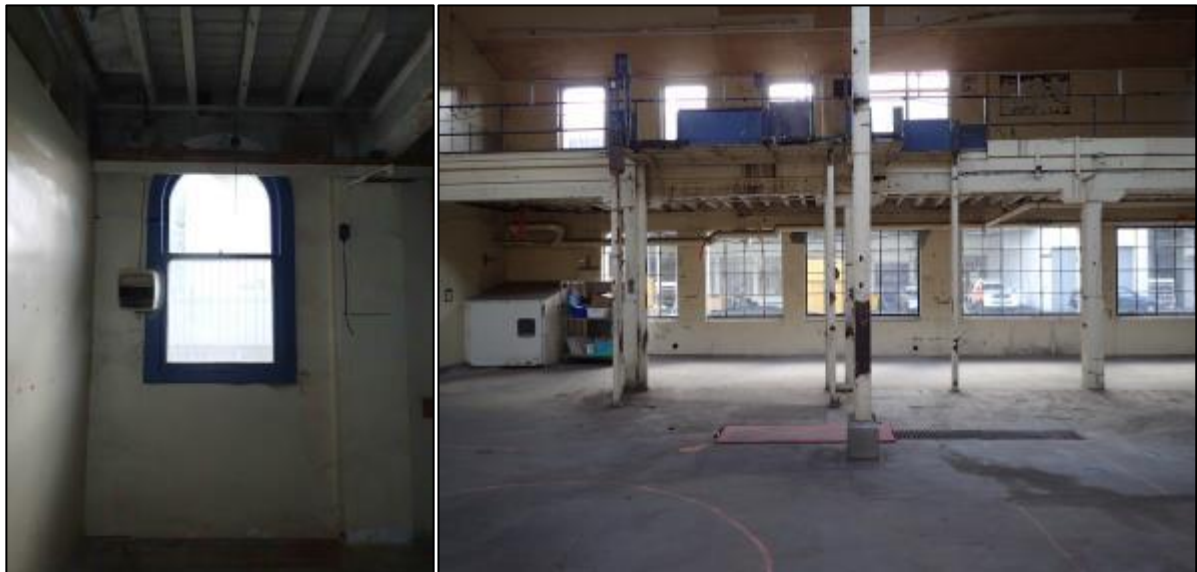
Photographs looking north at single hung sash window in the office portion of the Dairy and Machine House Building (left) and at multi-pane fixed windows of the dairy central portion (right).
